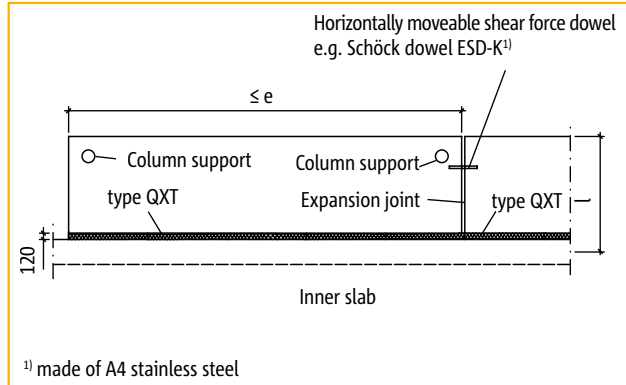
Layout of the expansion joints for balcony slabs with a straight-edged connection
